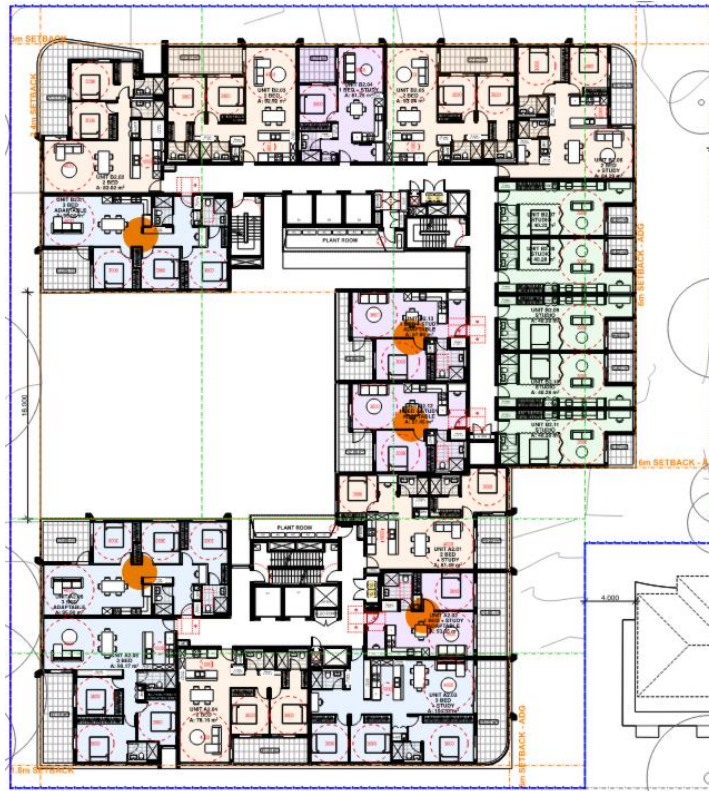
Second & Third Floor Adaptable Units Location on Architectural Plans
